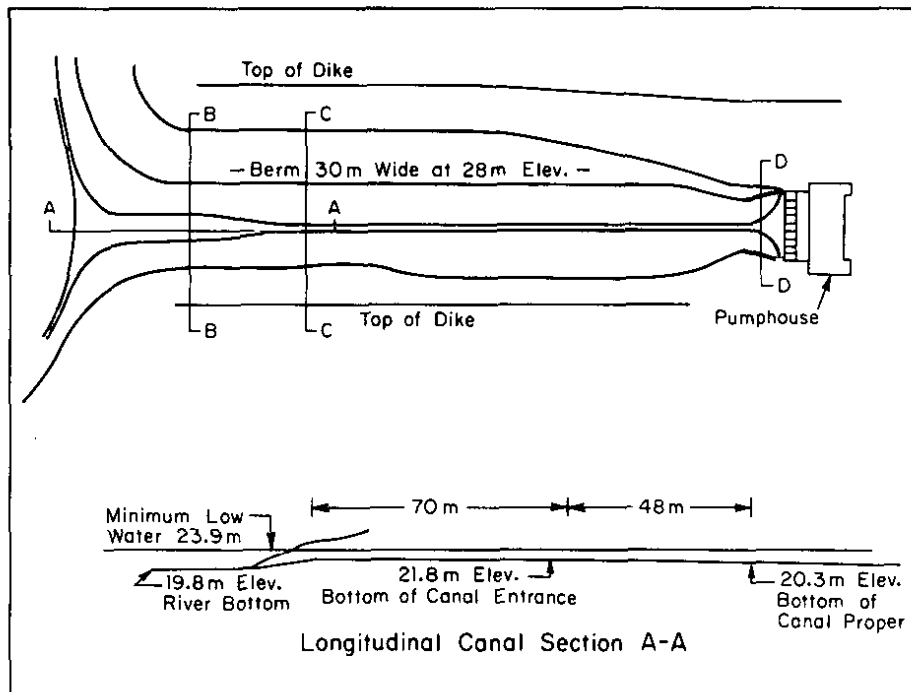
Plan View and Longitudinal Section of Entrance of 3G Canal
